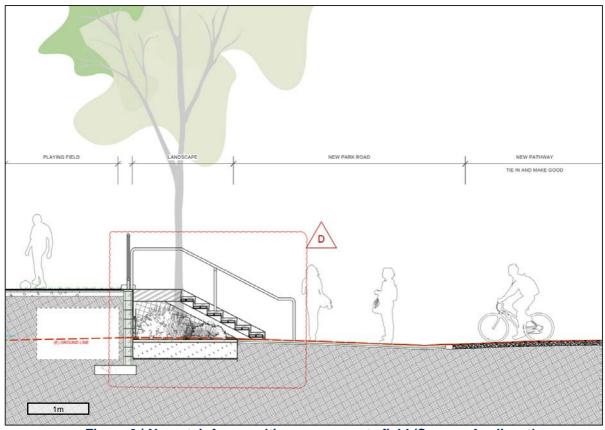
| New stair from multi-purpose sports field (Source: Applicant's Modification report 2022)
